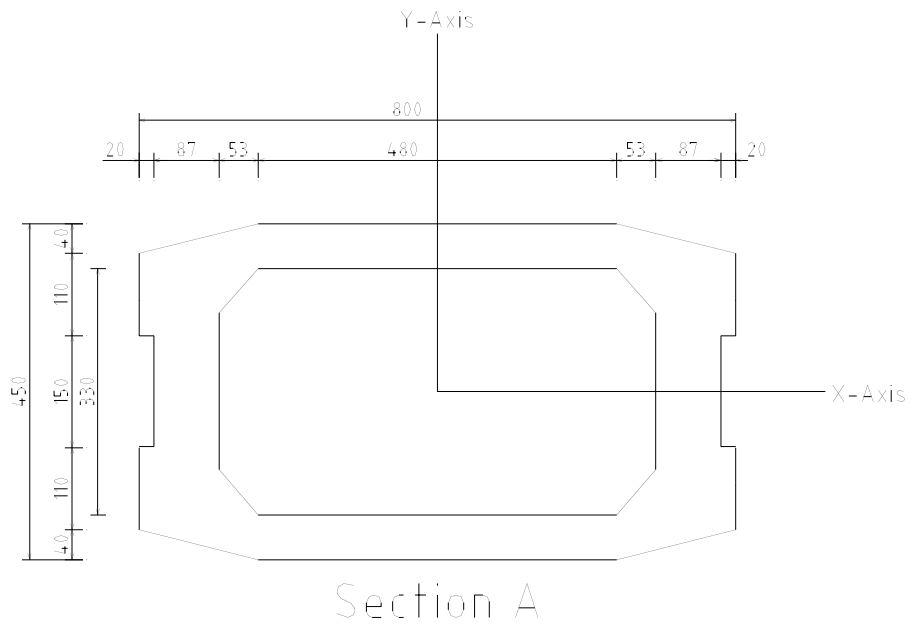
Cross Section at the Base of the Elevated Highway Pier
